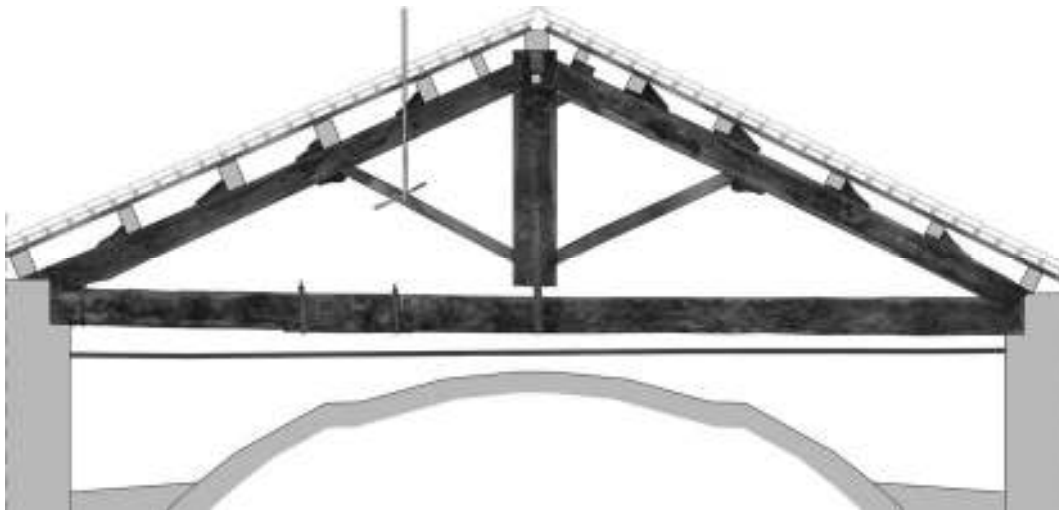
Northern façade of truss 2 (photoplan by M. Canestrone, R. De Marco, R. Delogu, G. Godio).
